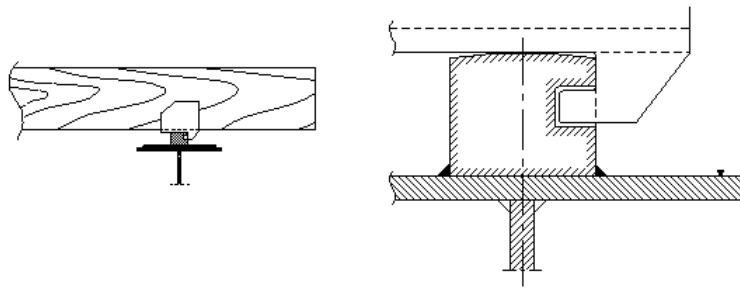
Detail of steel device connecting the sleeper to the bridge girder
